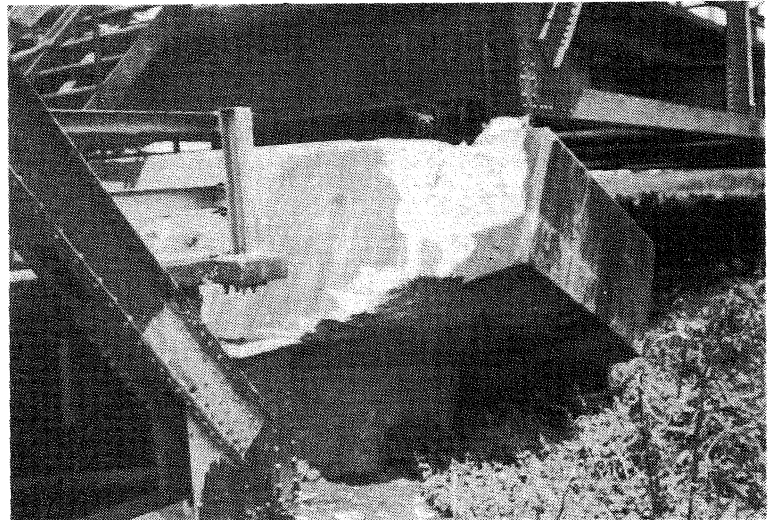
Carmen Bridge; liquefaction at pier between spans 11 and 12 viewed towards the northwest
